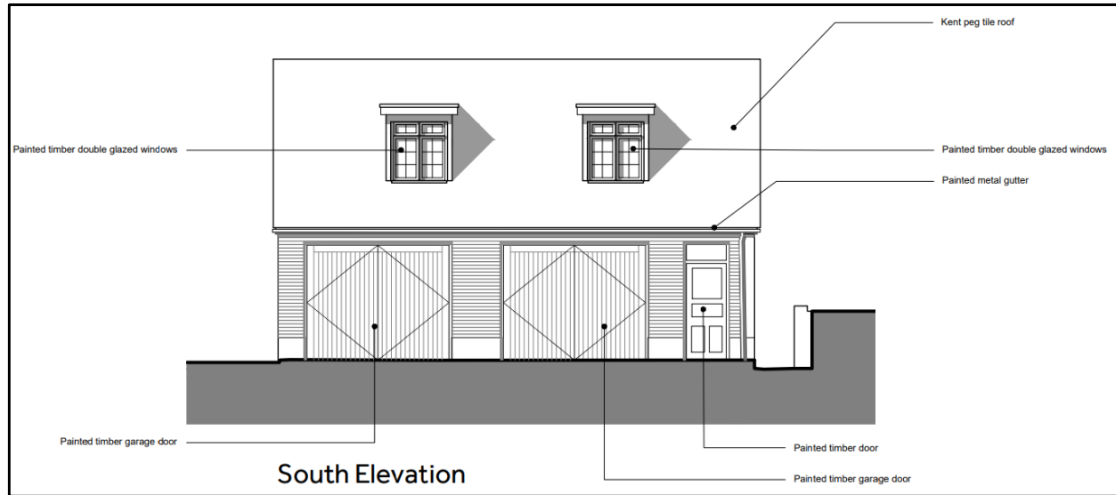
PROPOSED SOUTH ELEVATION OF GARAGE (CLAGUE ARCHITECTS)
